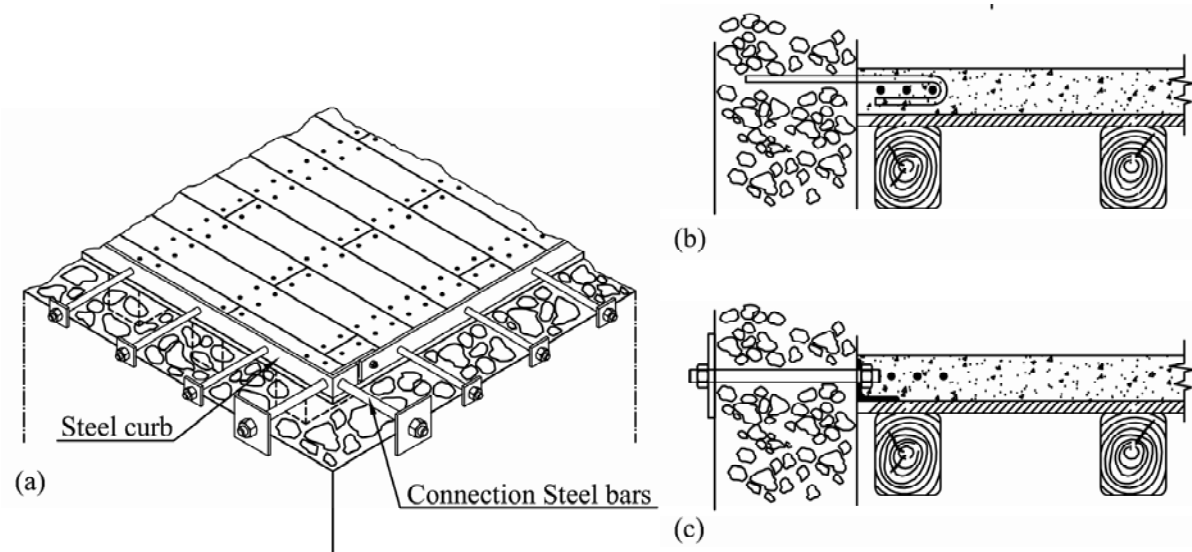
(a) Steel tie beams between the shear reinforced planking and the masonry walls, (b) Connection between the concrete tie beam and the walls, and (c) between the steel tie beam and the walls.
